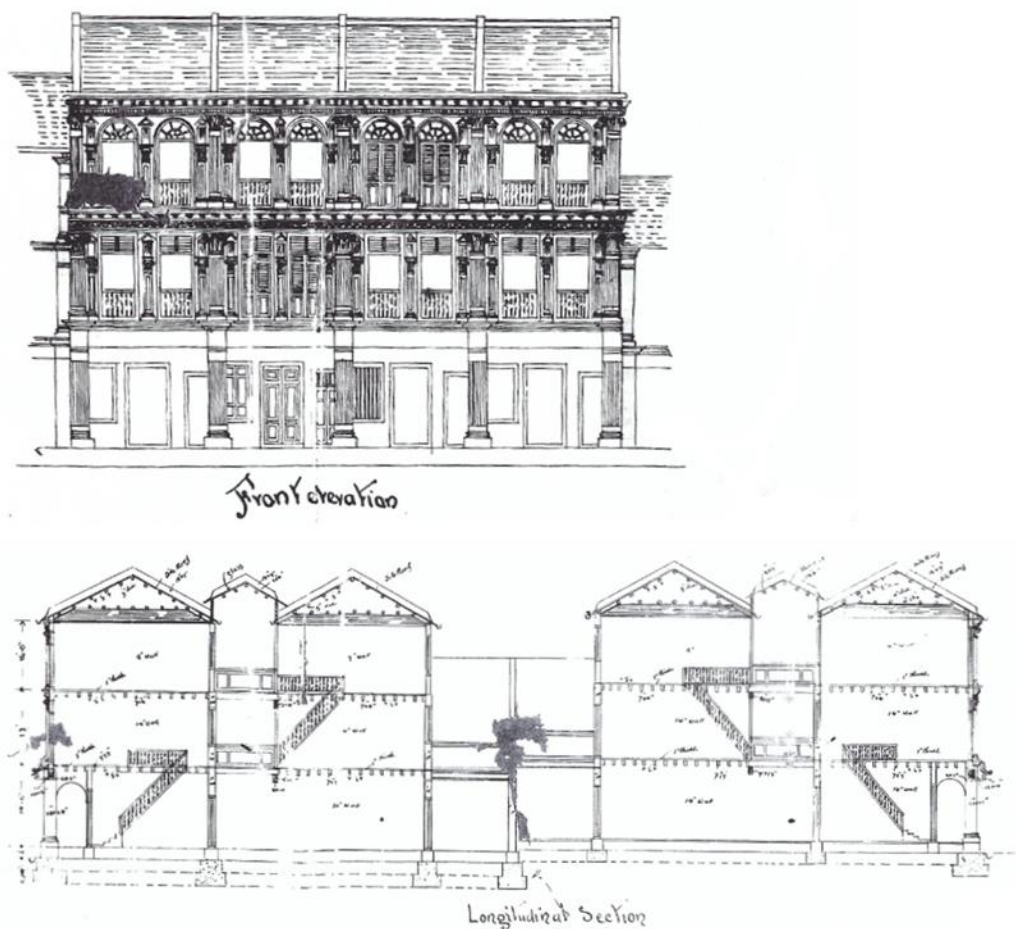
W.T. Moh. Elevation and section for eight shophouses at the corner of Sago and Smith Streets, Singapore, 1900. NAS CBS 117, Building Plan 4143.
